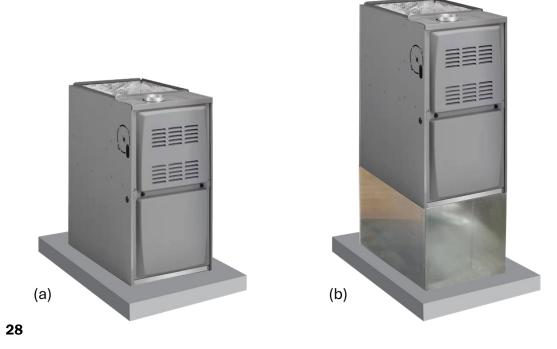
Elevating Furnace from (a) Original Position on Shallow Pad to (b) Elevated Position on Metal Furnace Base
